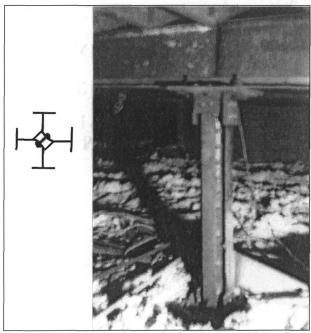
Attic column with cross-section sketch of column composition (photo by J. Jacobsen, 2006)
